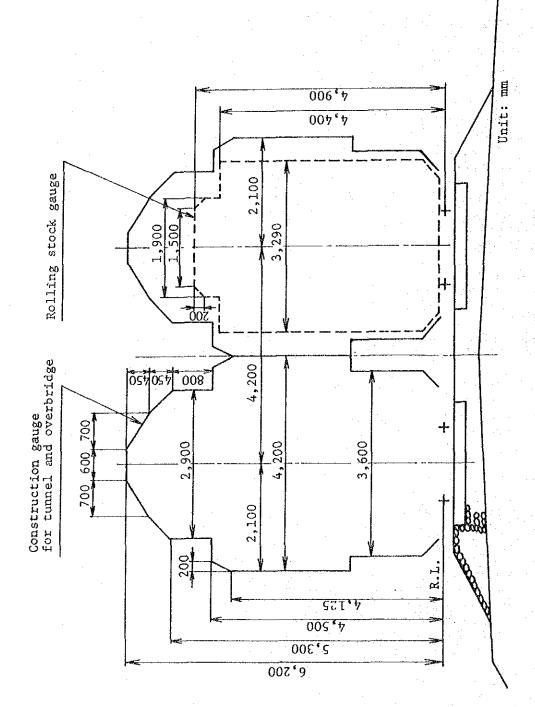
Rolling Stock Gauge and Construction Gauge
